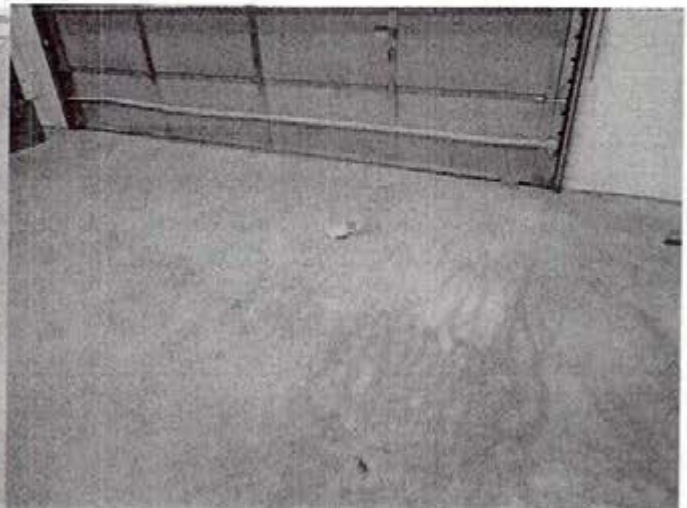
Army National Guard Firefighting facility; view to the east.
